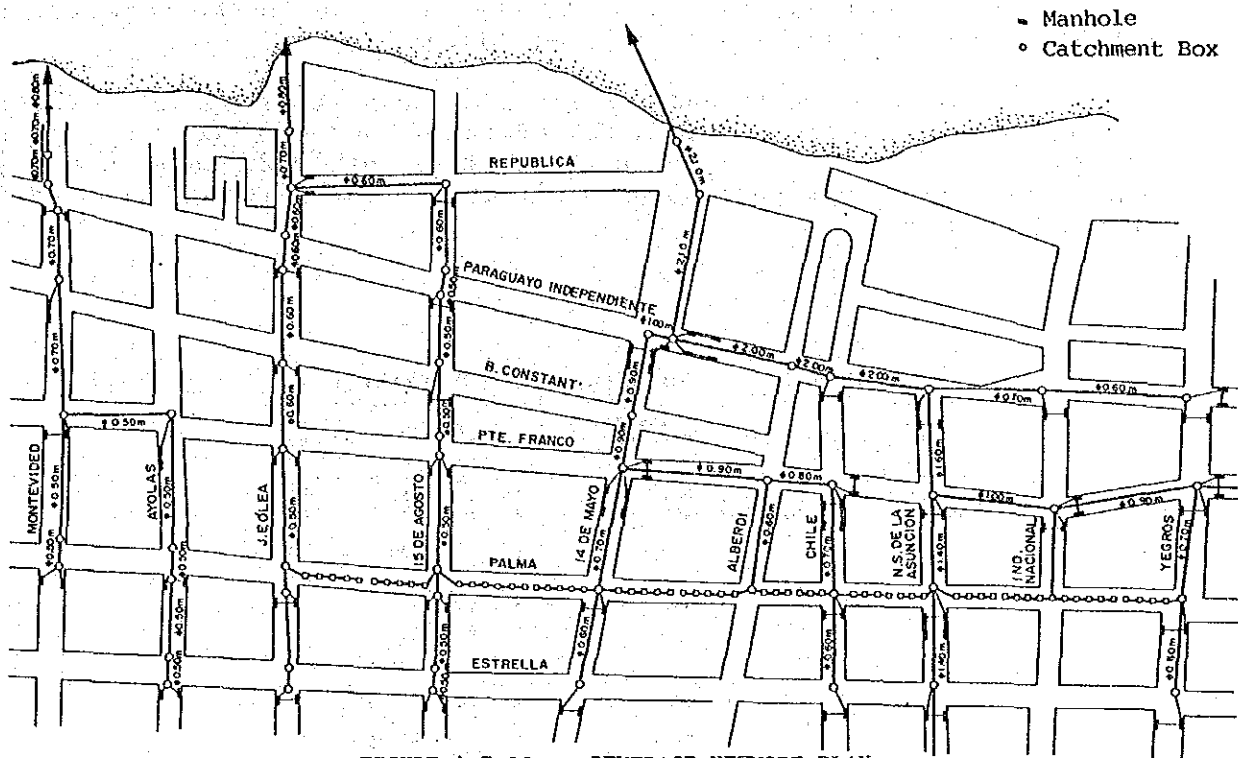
SEWERAGE NETWORK PLAN
